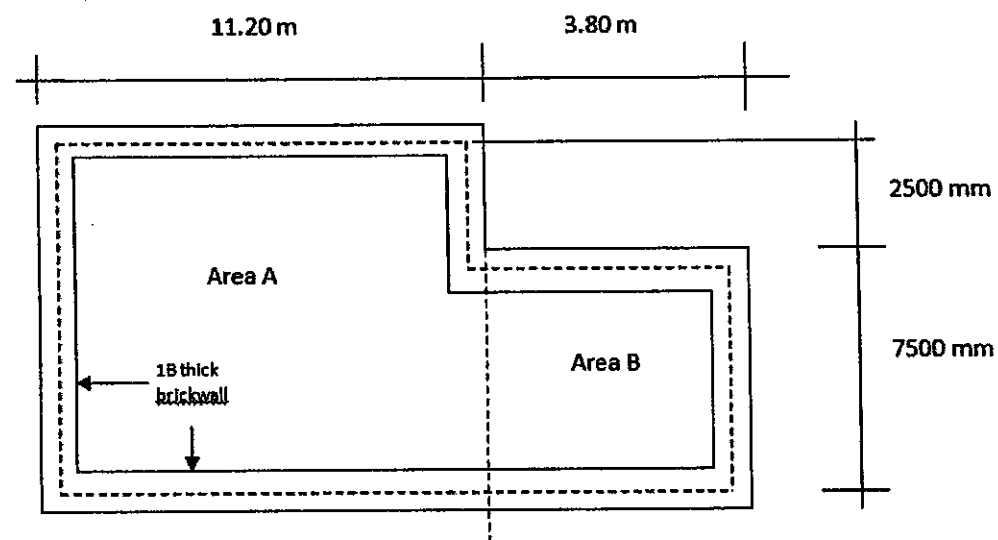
(a): Floor Plan/ Rajah B1(a): Plan Lantai
